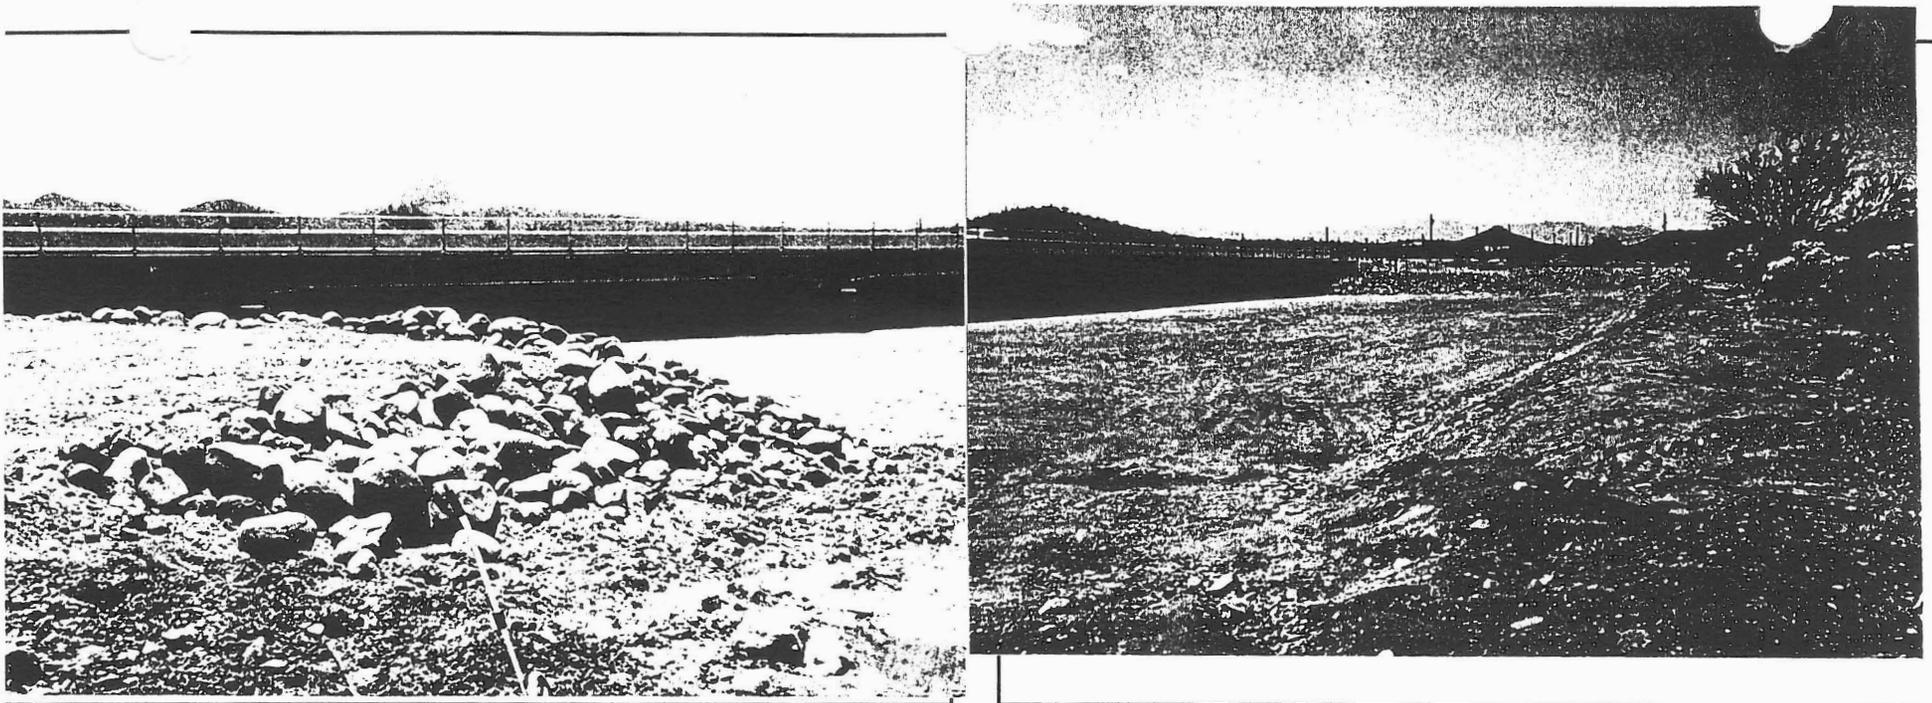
Reach P. Looking downstream at face of New River Bridge, Cross Section #49.
